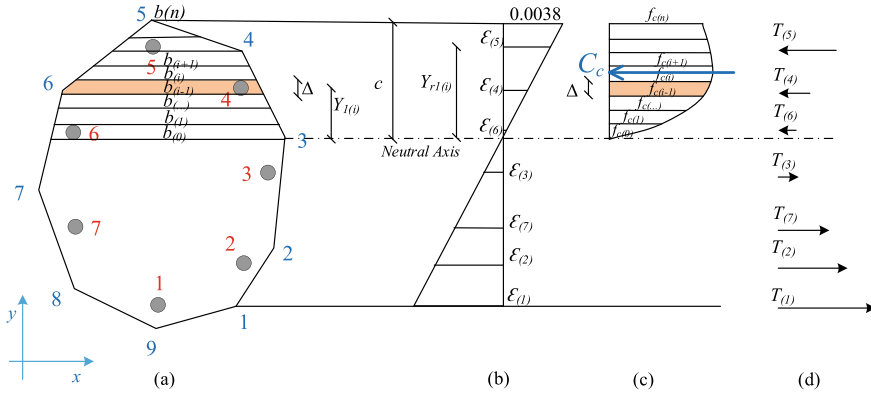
a Section. b Strain diagram. c Concrete stress block. d Forces of reinforcements
